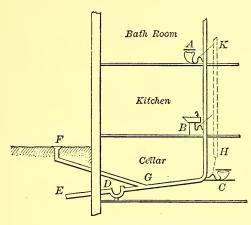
House Drainage. A, B, C, Plumbing fixtures; D, disconnecting trap; E, branch sewer; F, ventilation opening; G, house drain; K, H, vent pipes connected by dotted lines with each trap.
